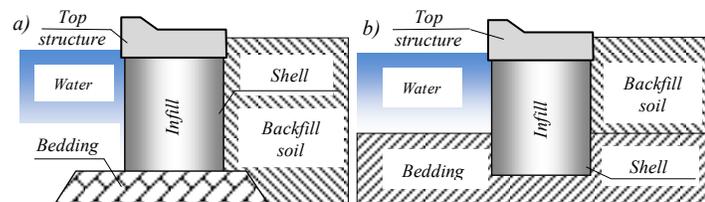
Layout of a berth made of large-diameter shell: a) the shell on the "rock bedding"; and b) the shell restrained into the existing bedding
